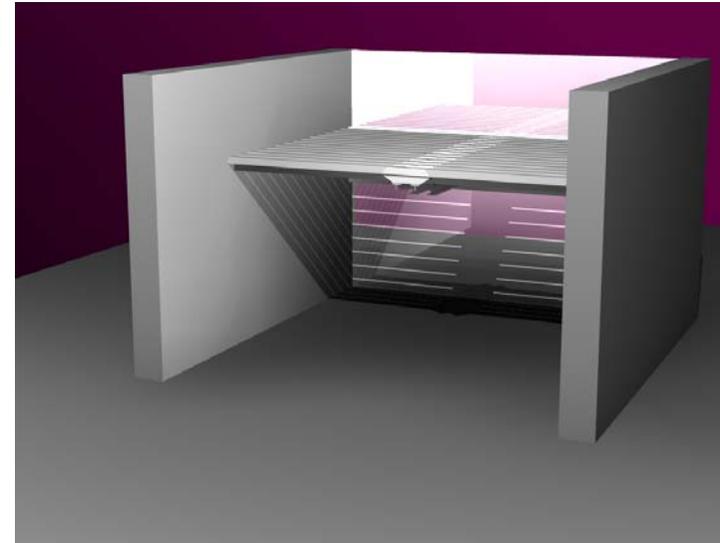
Repurposed Concrete palisades used as shading (winter) (Source: Own Image)
